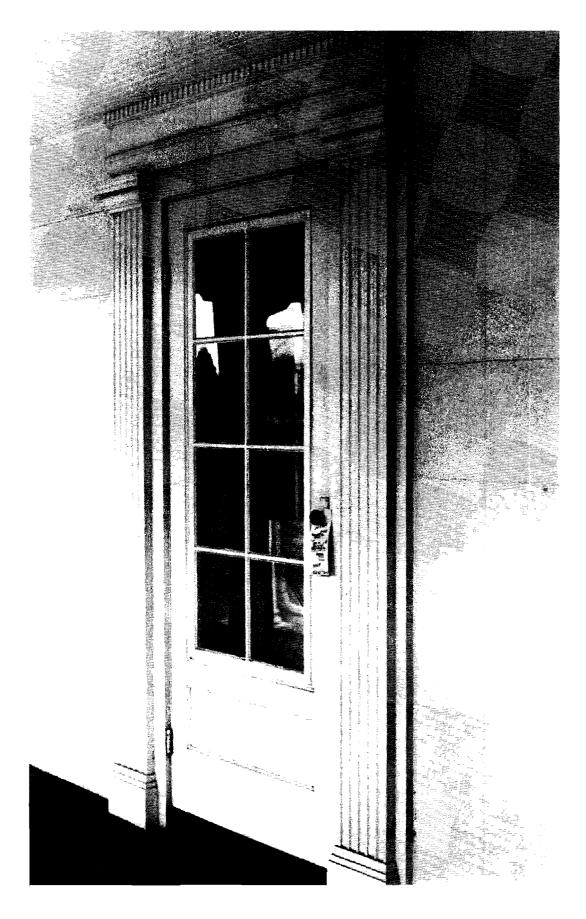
Silver Hill Farm, Farmhouse, Main Entrance
